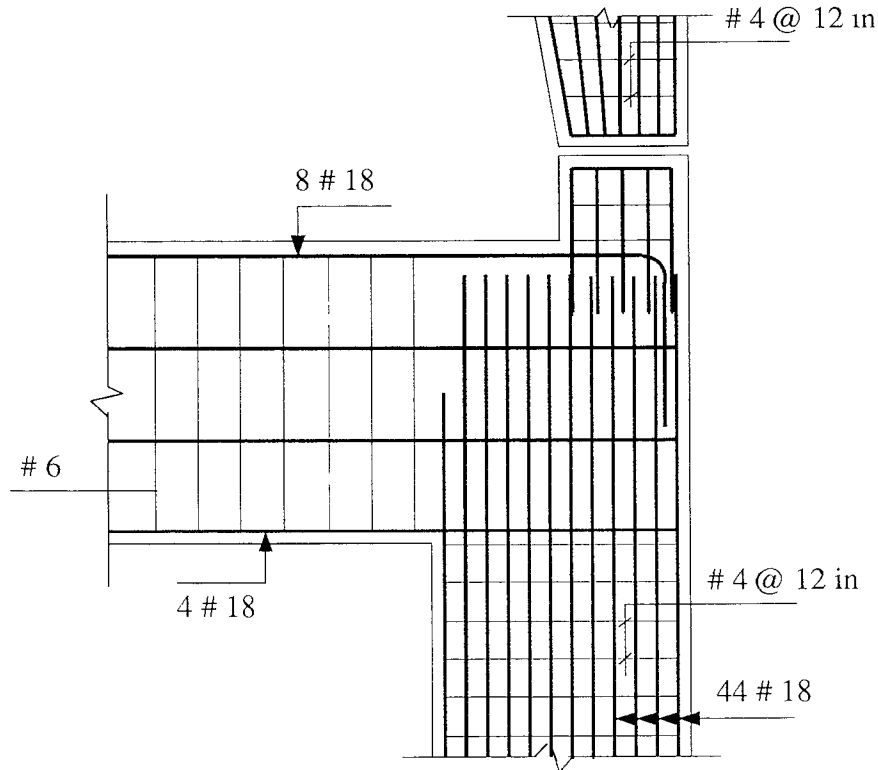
Lower Level Joint Detail of Type B1 Bent.
